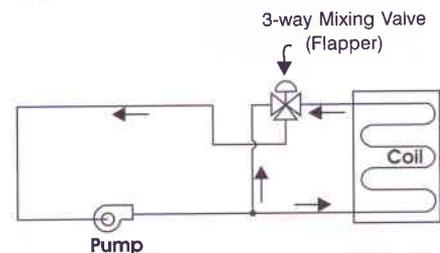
Piping connections with Flapper type 3-way mixing valve.
